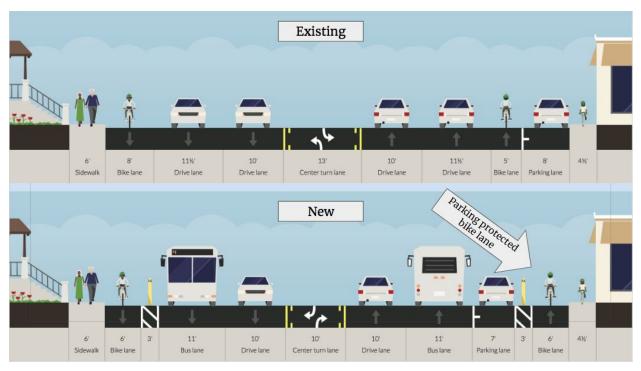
Current existing and new proposed recommended dimensions of Water Street at the Reed to Market segment. Graphics developed using Streetmix.
